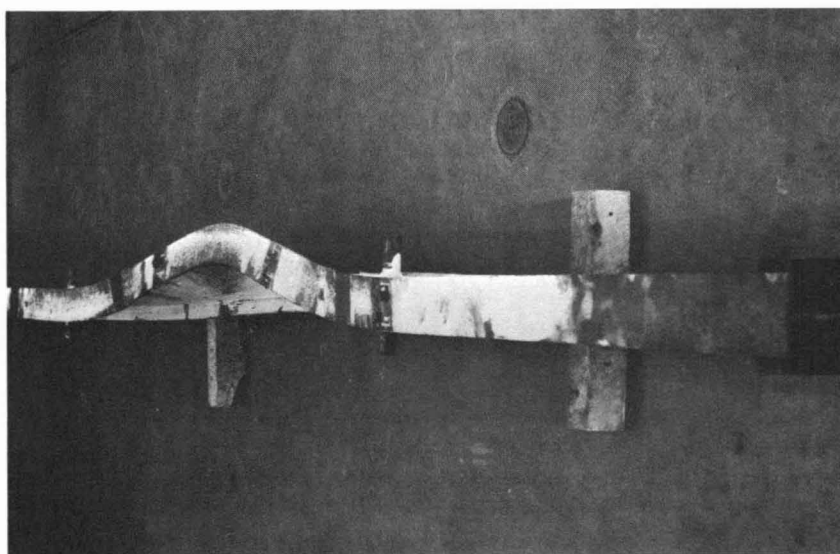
DEFORMED SPECIMEN AFTER TEST RC-1
